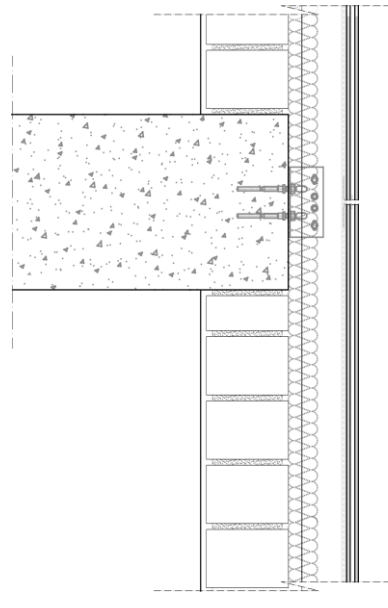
Vertical section. Faveton® SAH Ceram 20.
